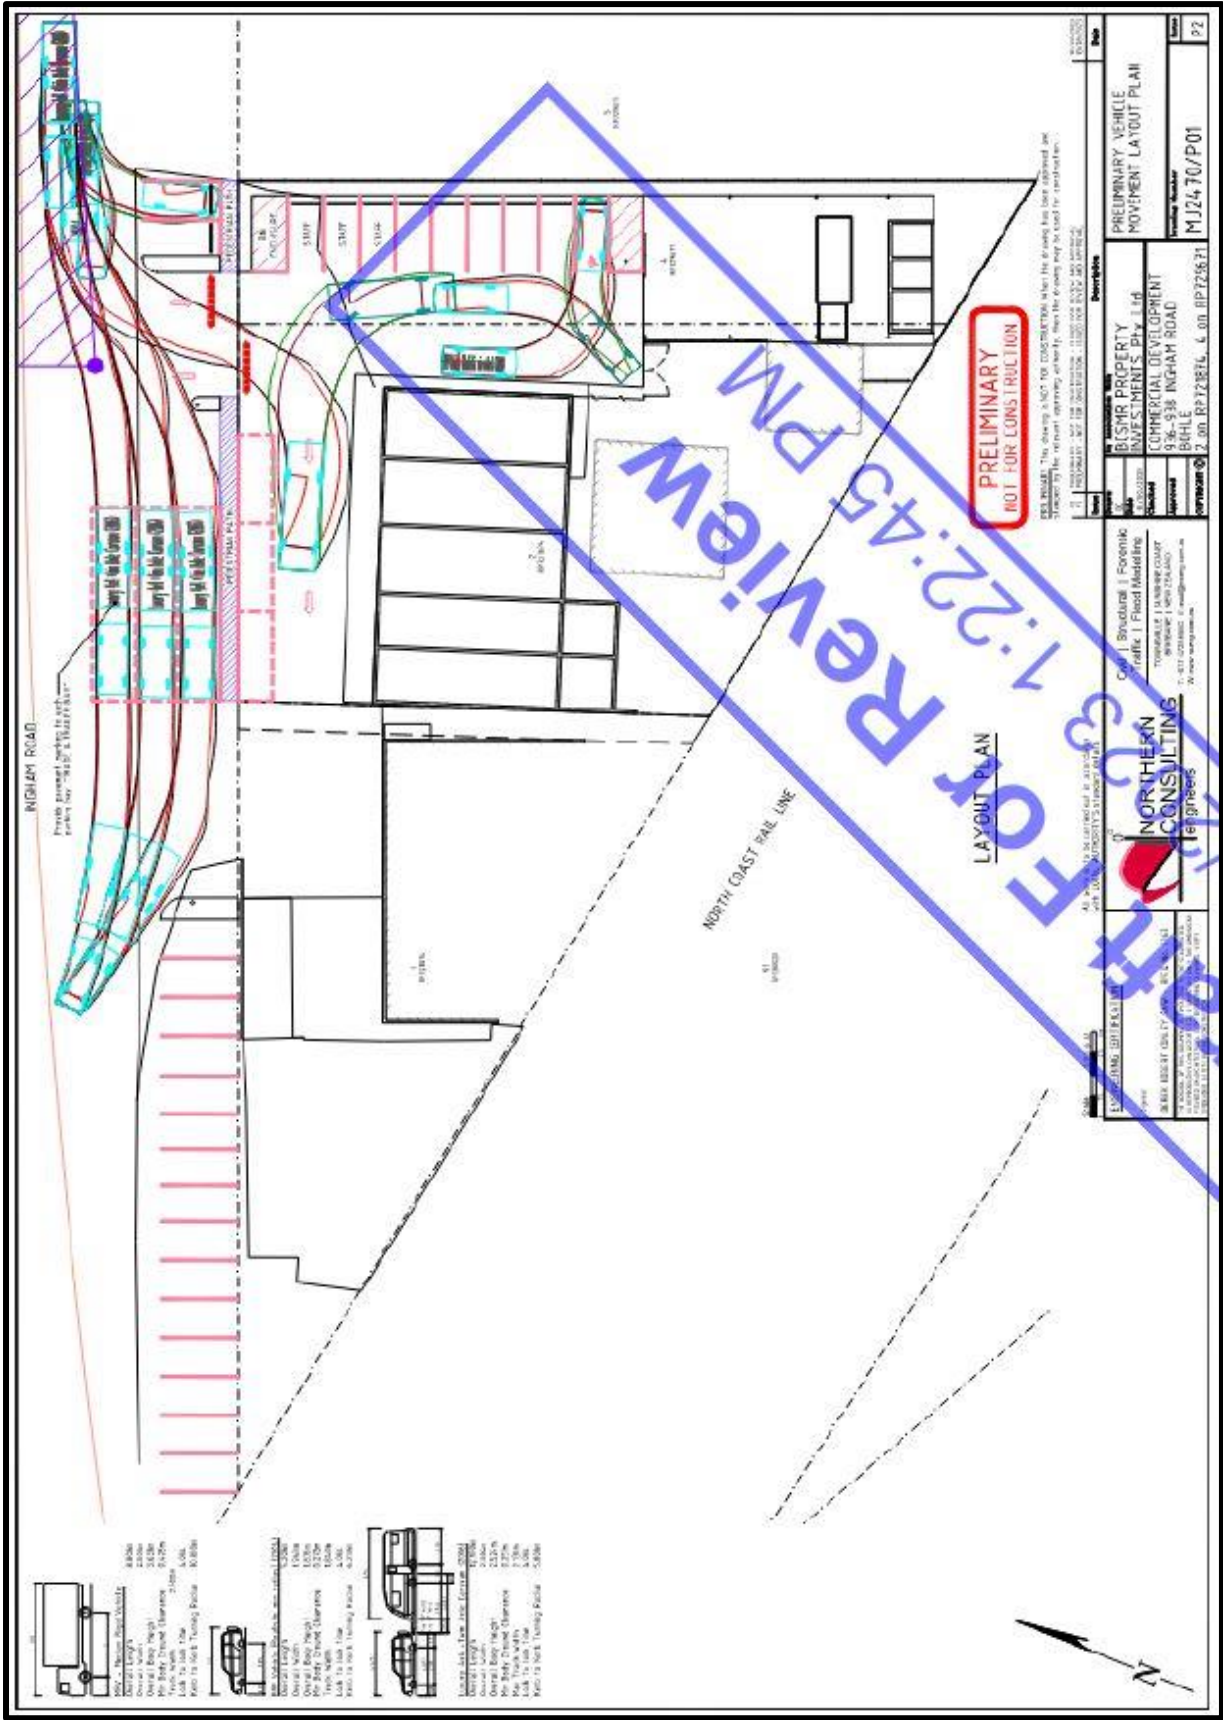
Swept Path analysis of proposed development plan (Northern Consulting).
